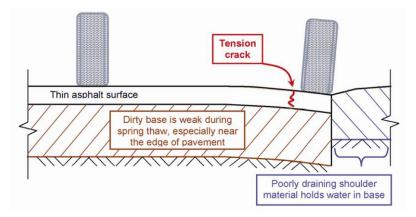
Schematic view of cracking at the edge of pavement [1]
